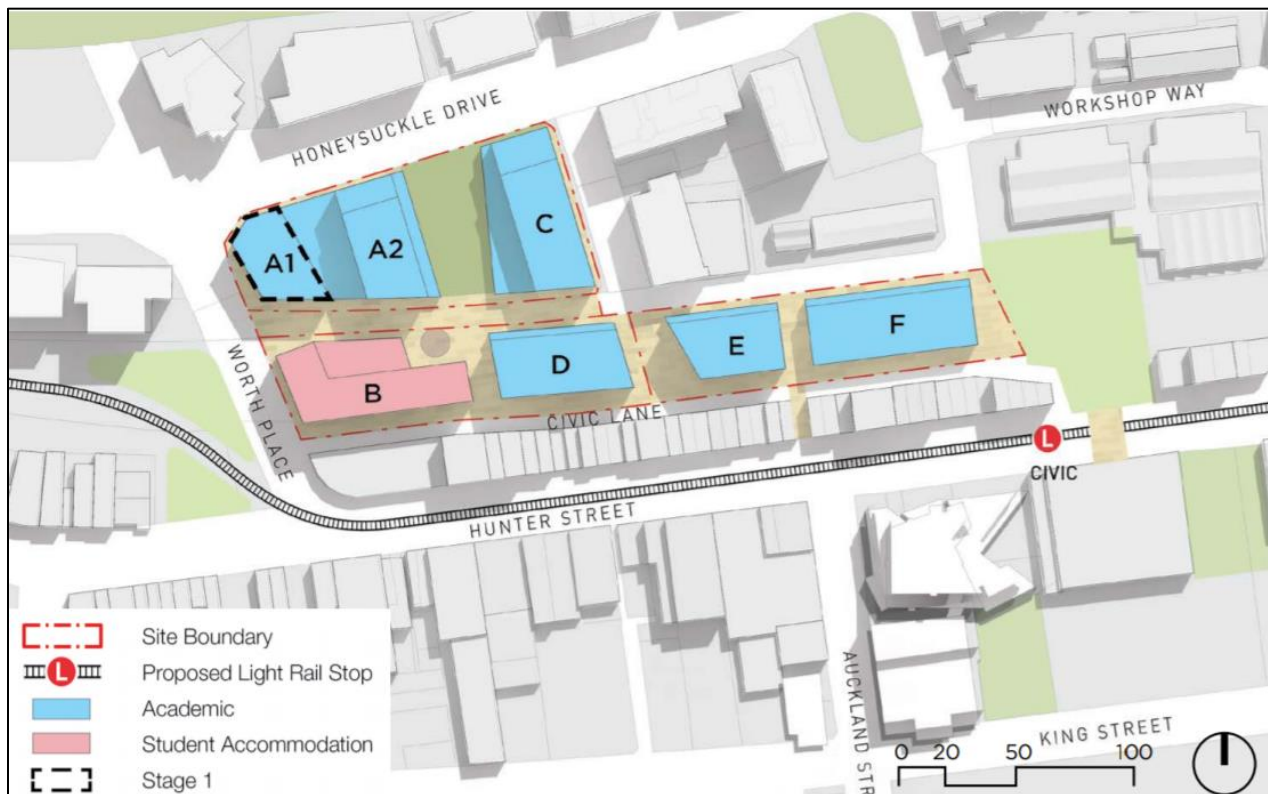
UoN HCCD—CONCEPT PLAN PROPOSED BUILDINGS (SOURCE: COX ARCHITECTURE 2017)
